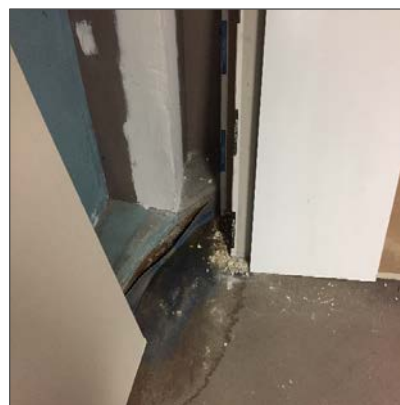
Asbestos-containing drywall joint compound debris, Basement Storage Room at Entrance to South Wing, West Wing.
